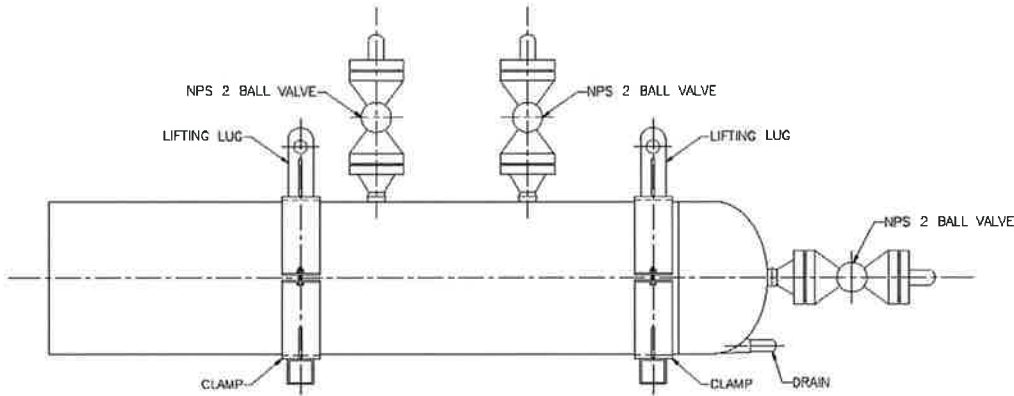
Sample Test Cap Layout (NPS 12 to NPS 48)
